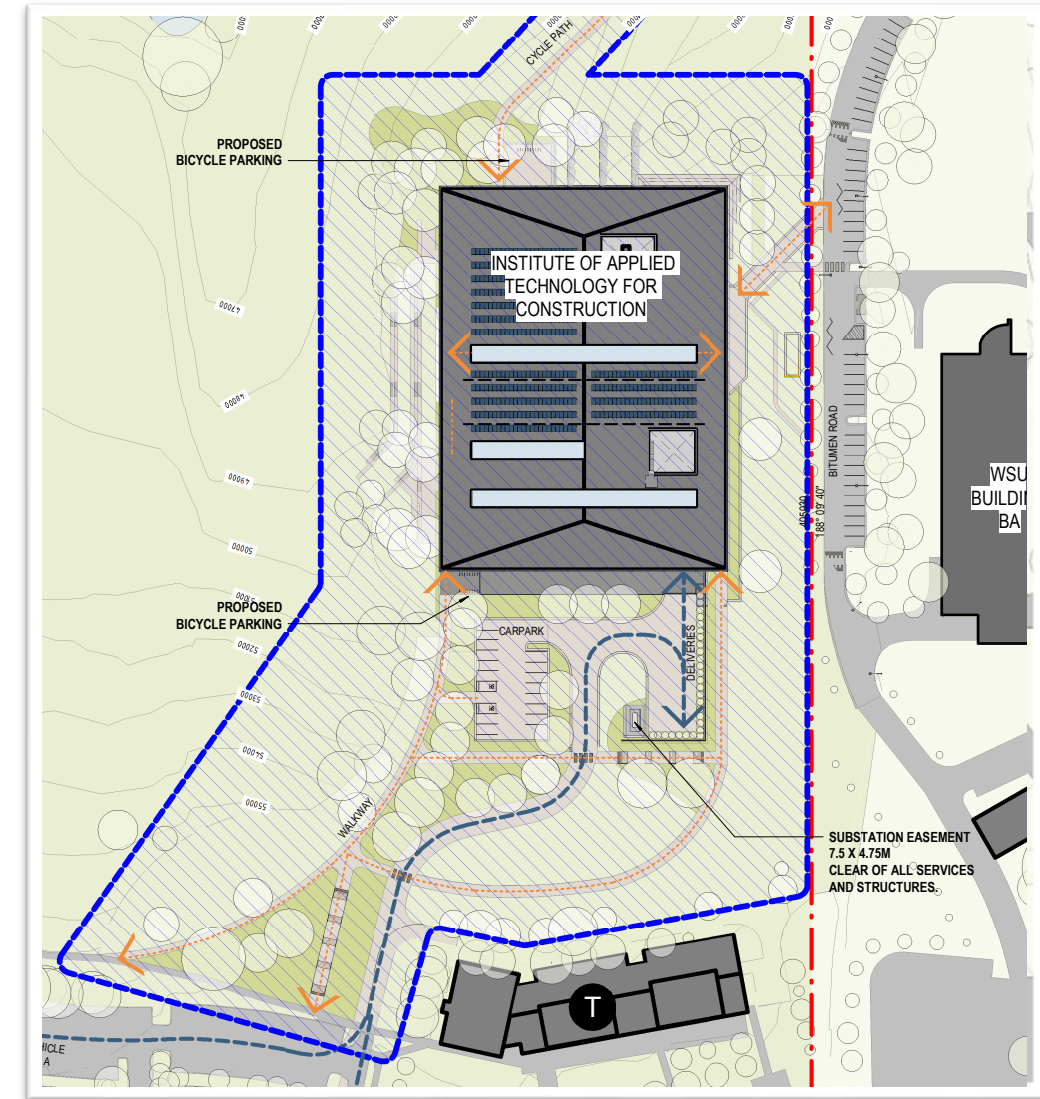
Proposed Building Layout (Gray Puksand, 2021)
